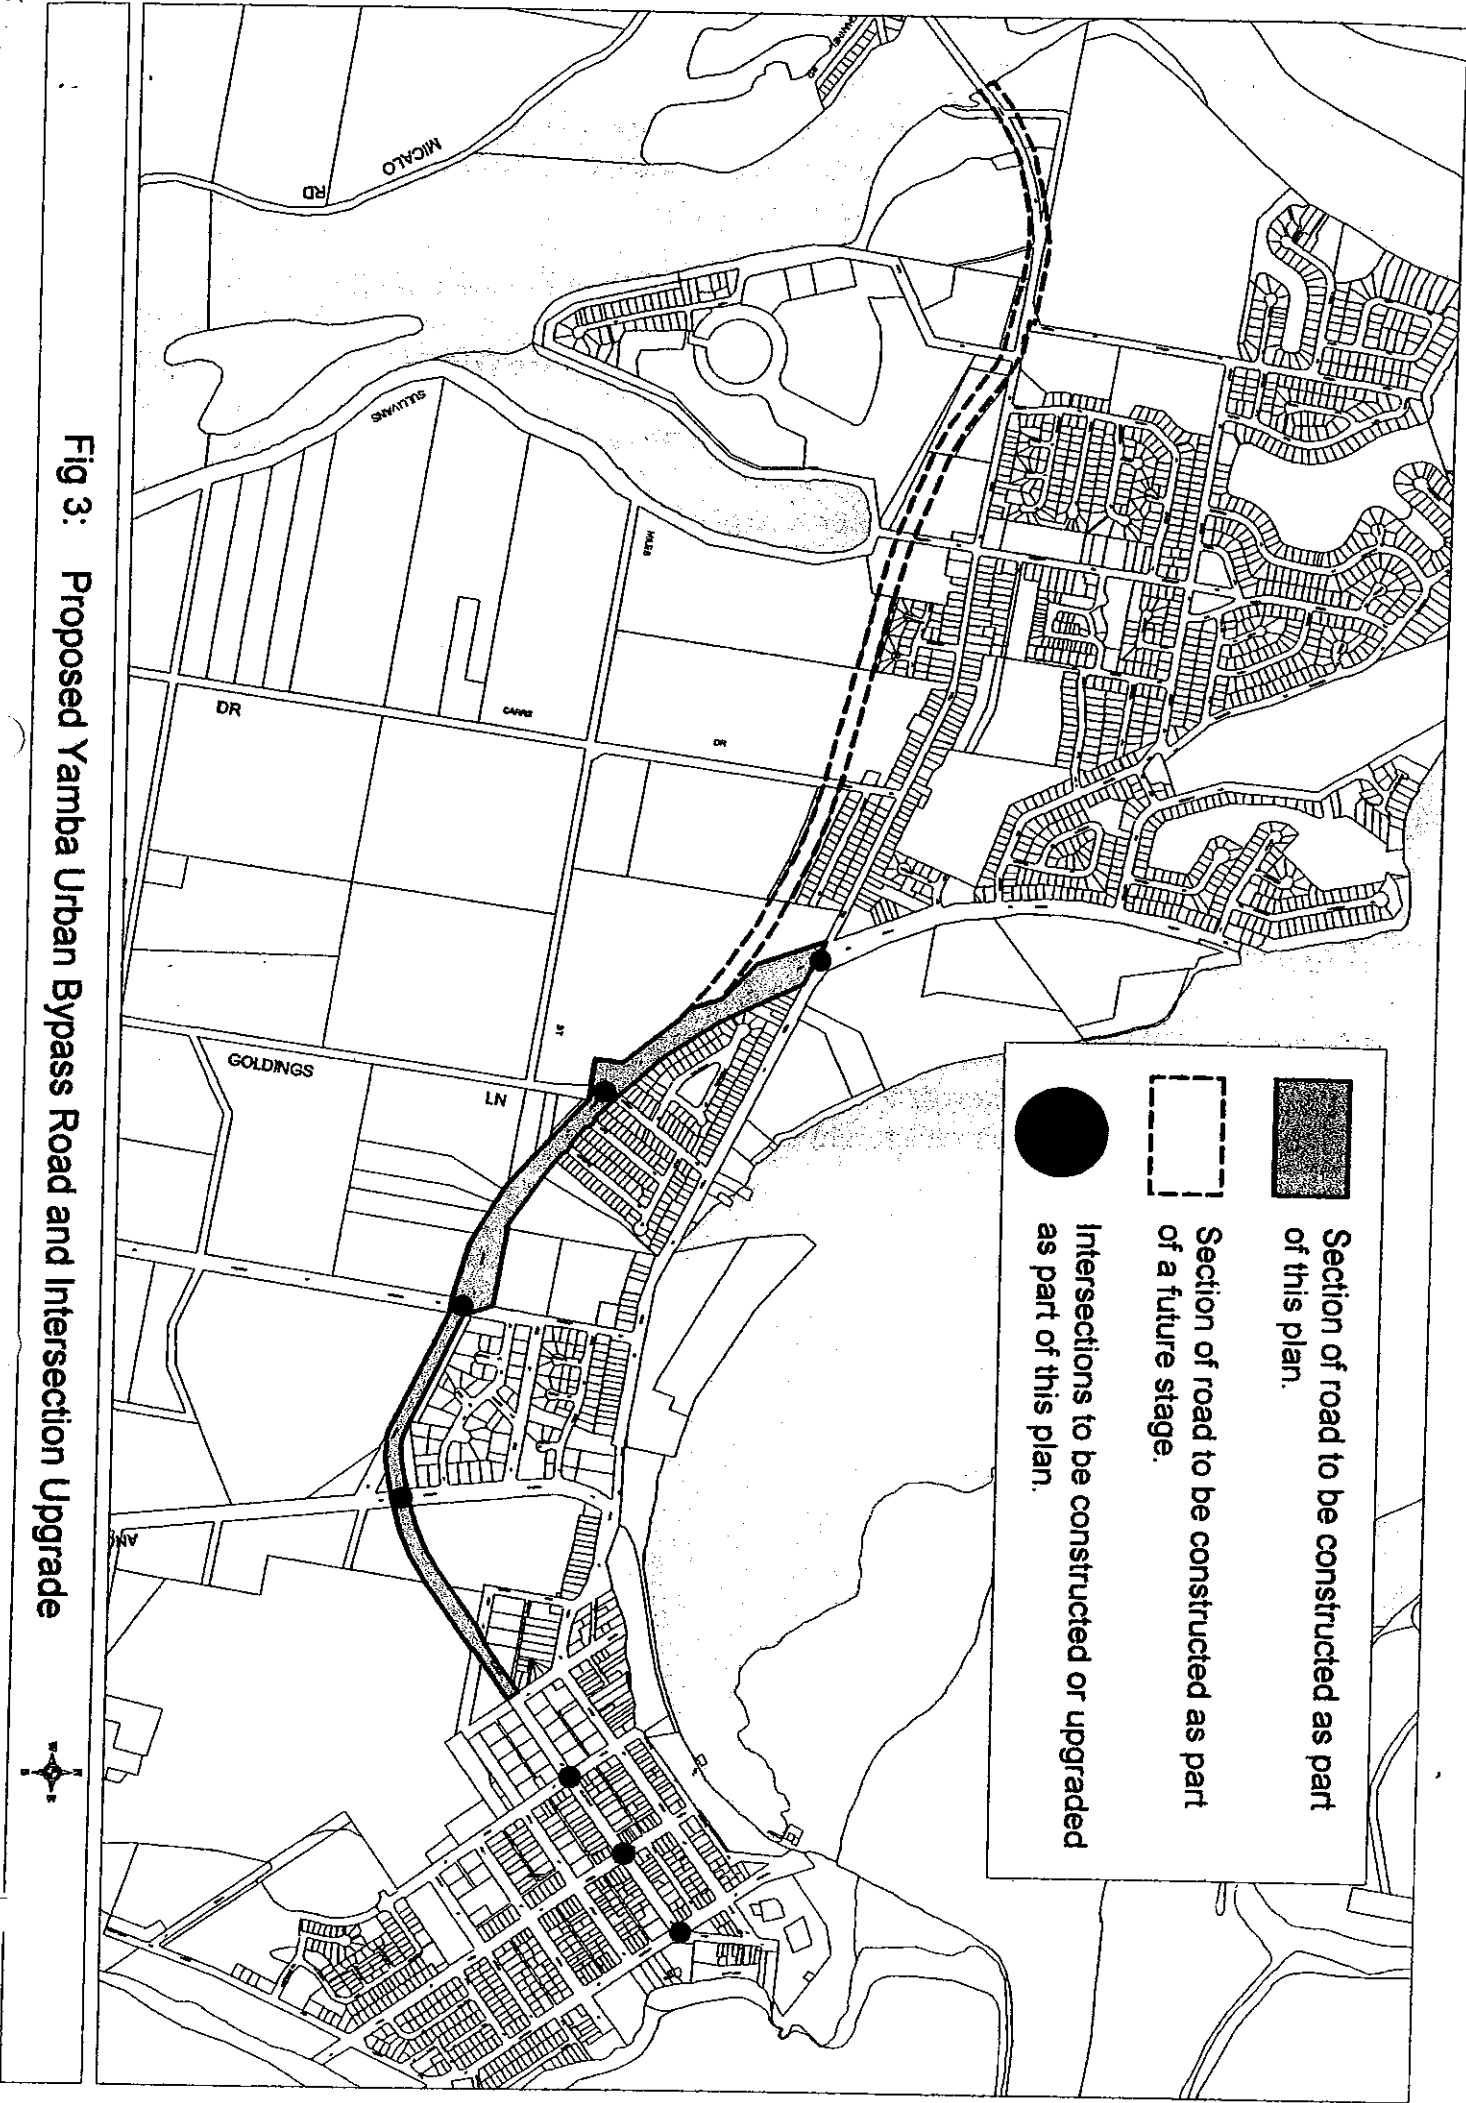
Proposed Yamba Urban Bypass Road and Intersection Upgrade
